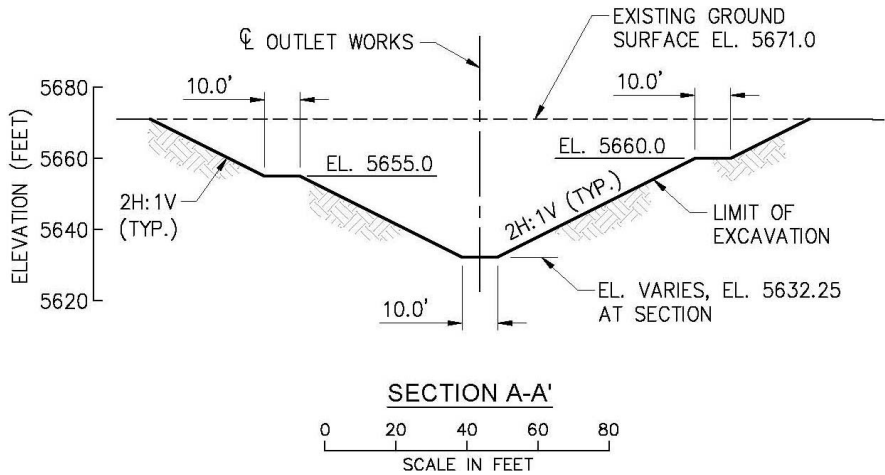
S-12. Cross Section A-A' of Excavation Showing the Intermediate Benches
